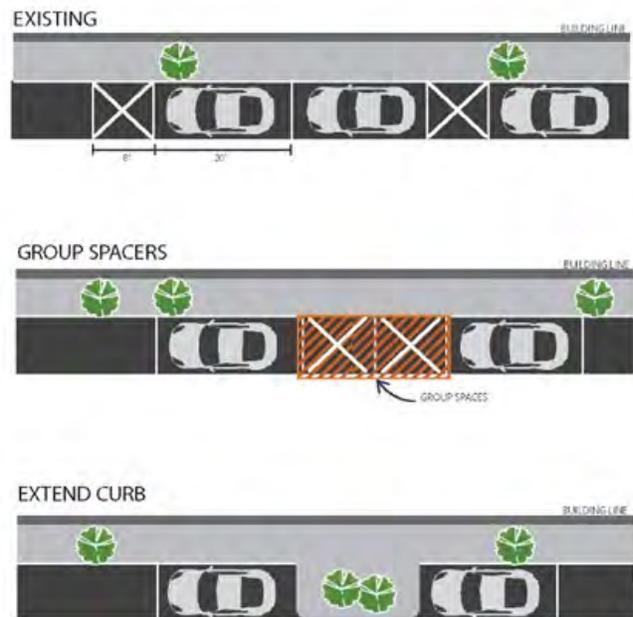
CREATE CURB EXTENSIONS ON GREEN BAY ROAD TO WIDEN SIDEWALK
